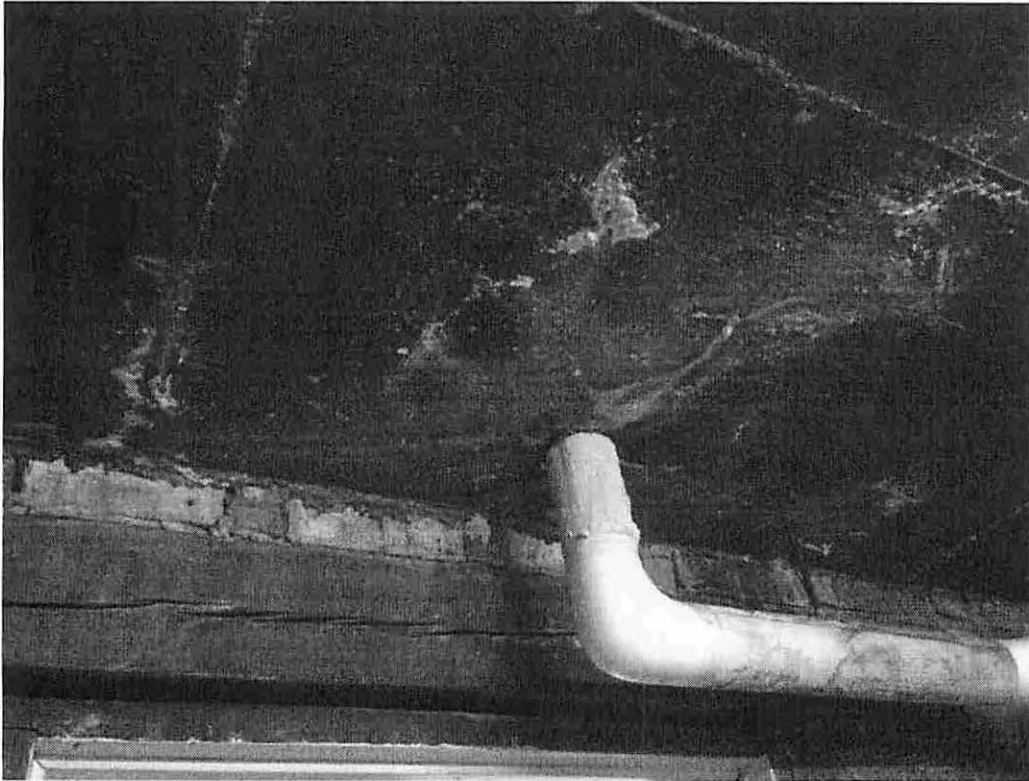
Corrosion, spalls and efflorescence due to leaking at floor drain.
